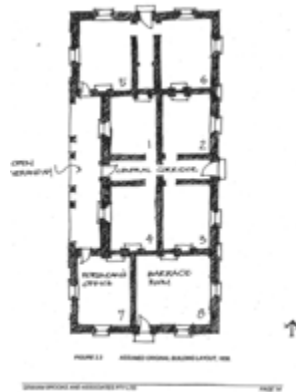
ASSUMED 1838 PLAN OF THE BARRACKS
